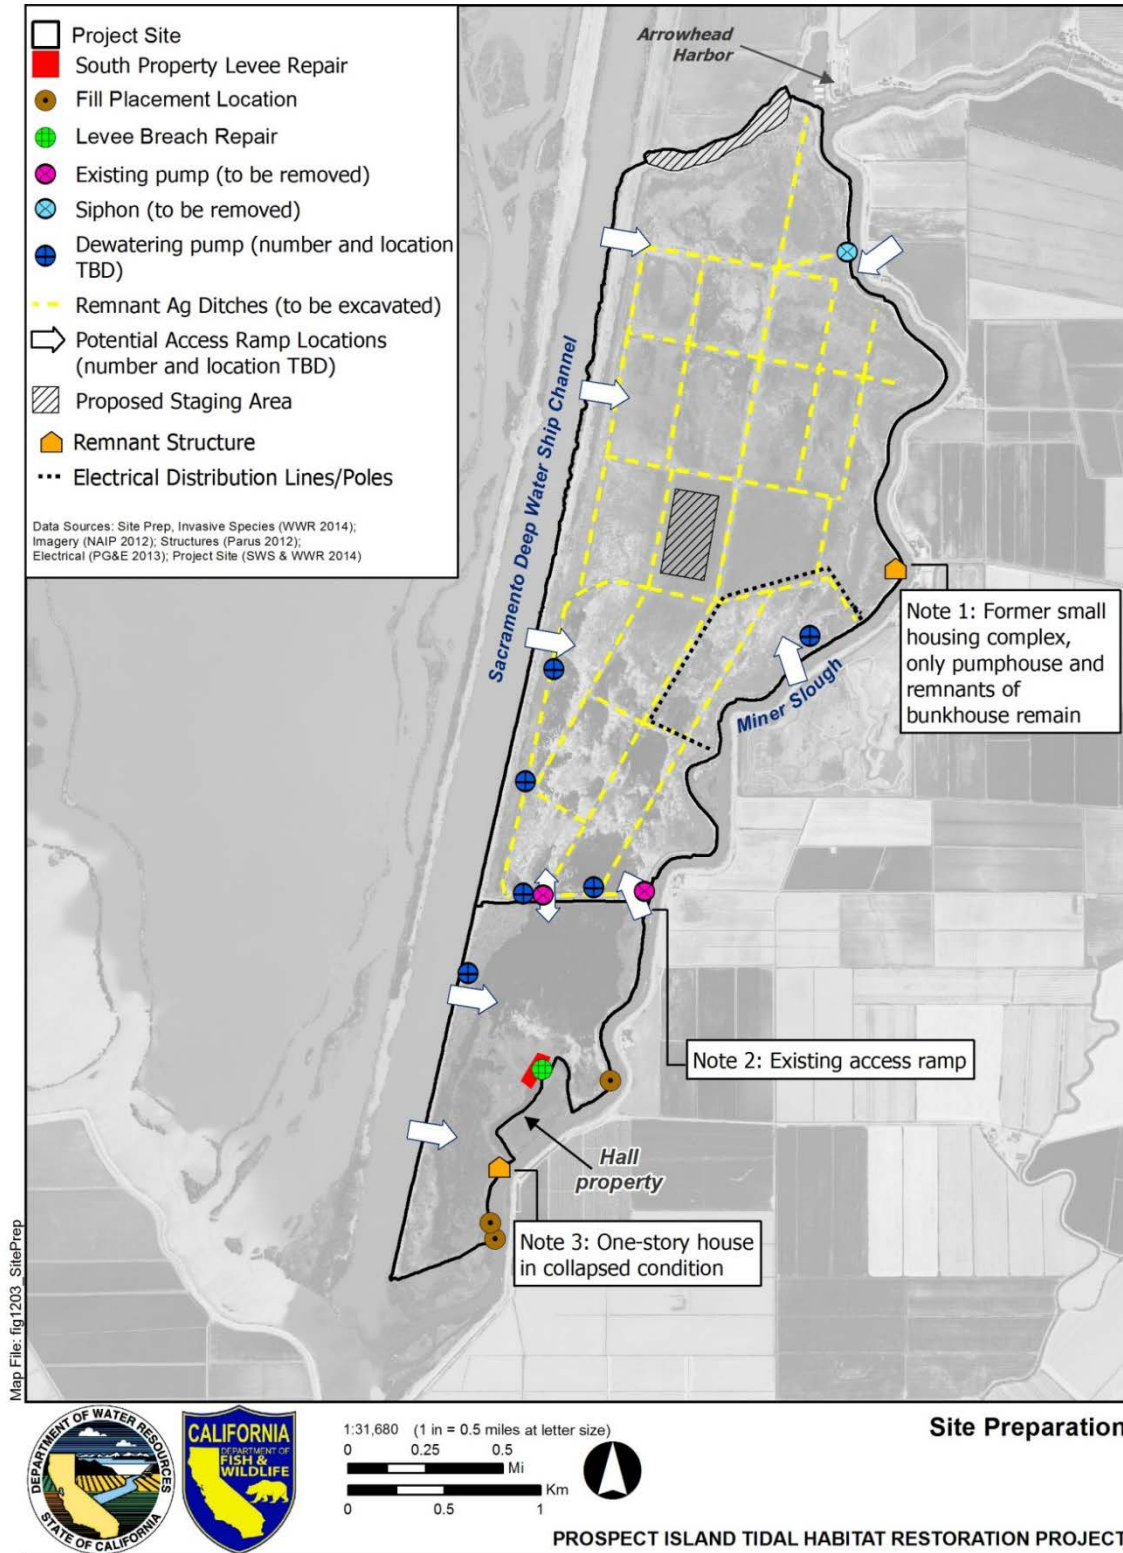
Site preparation schematic, showing clearing and grubbing areas, remnant structures to be removed from the site, and potential access ramps for construction.
